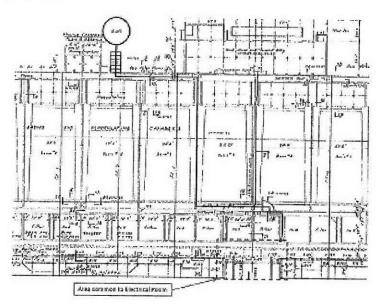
183-D Walk Down Path to Filter Building, and Pump Room and Electrical Switchgear
